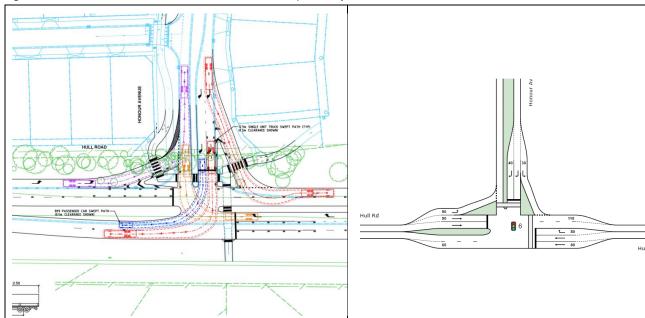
Honour Avenue / Hull Road Intersection – Proposed Layout
